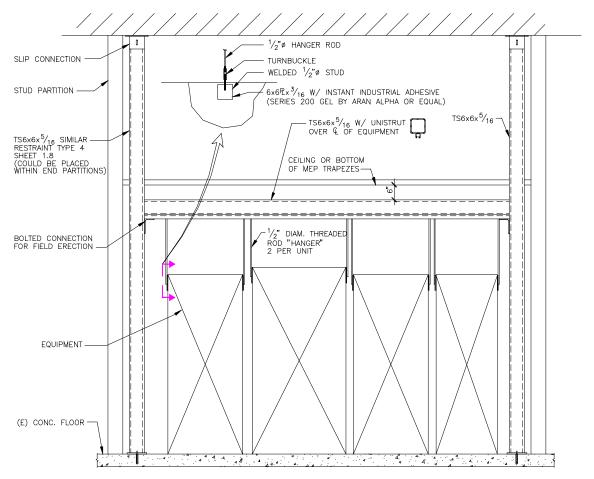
Alternative Equipment Restraint System at Equipment Halls (Requires Engineering Design)
